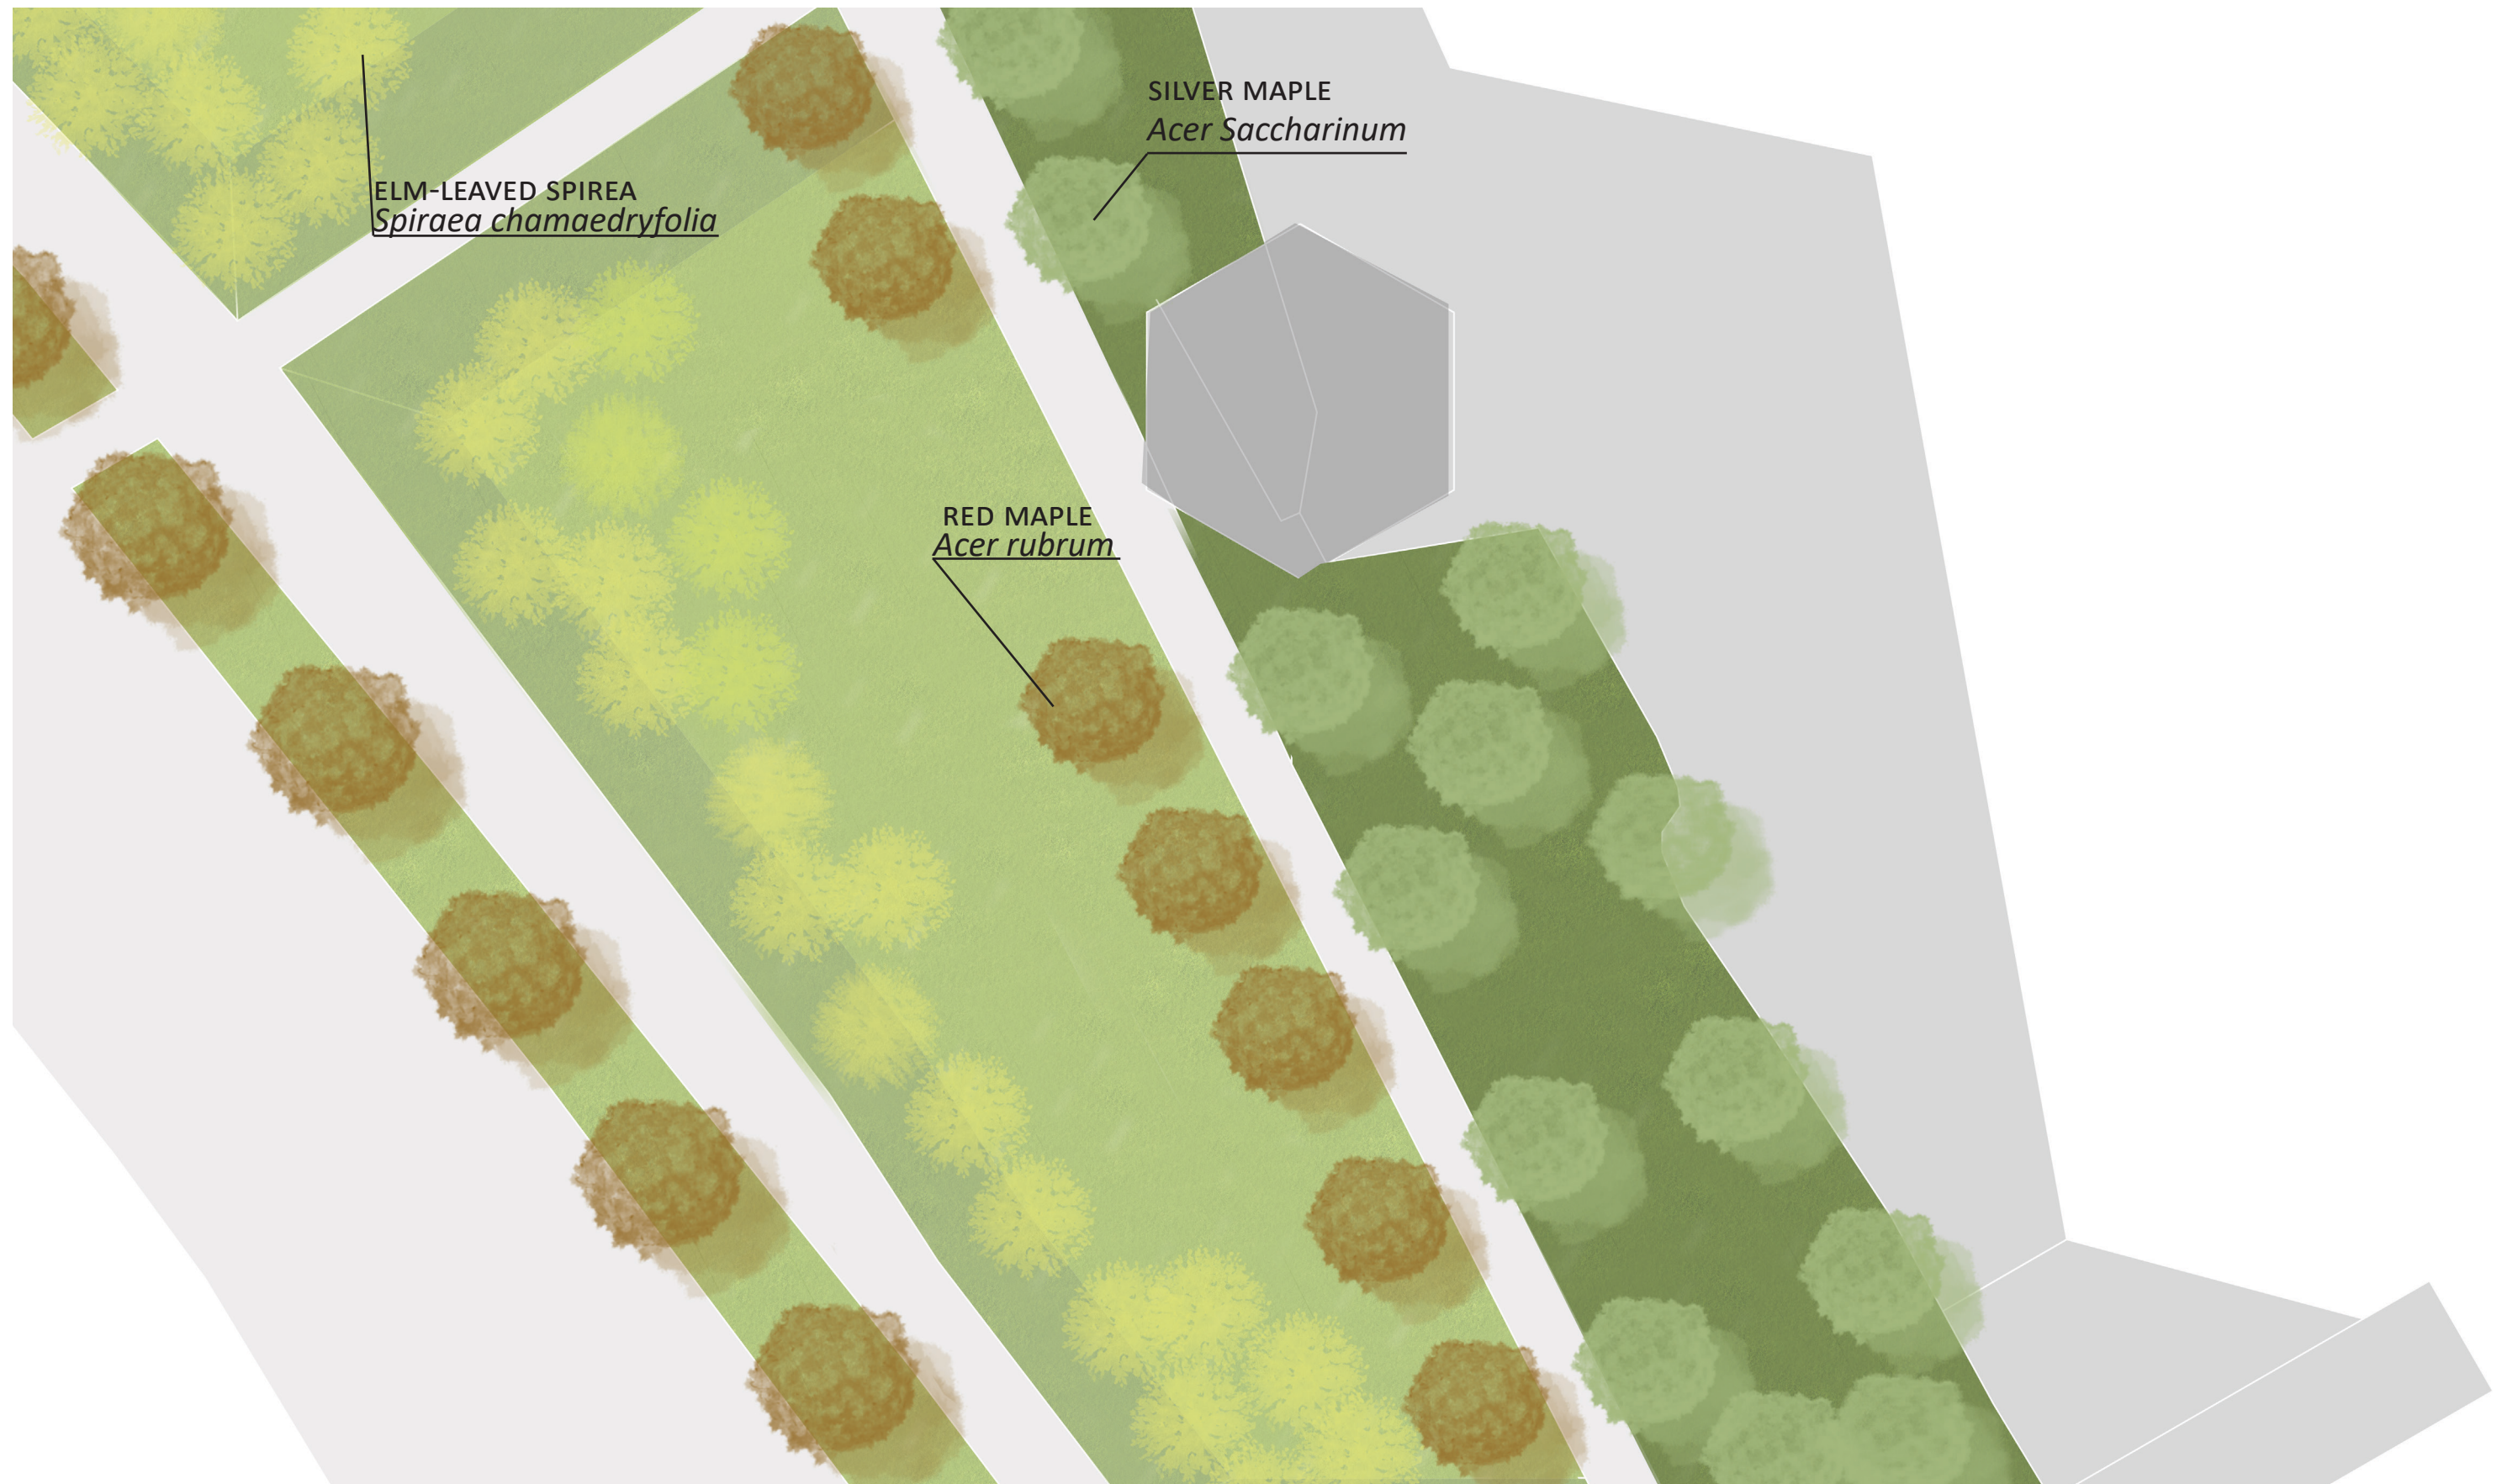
Planting plan showing new planned plants on the raised ground and next to the promenade. (Planting plan 1:250)
